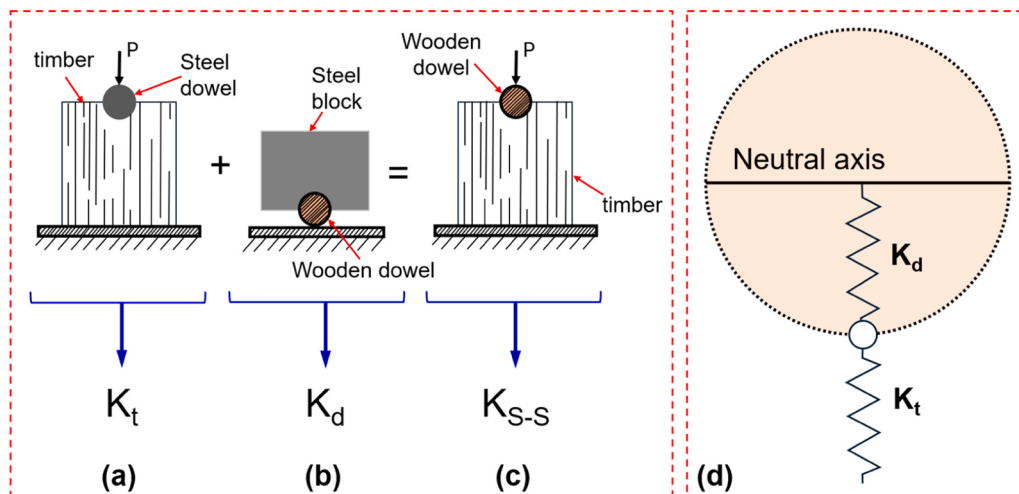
(a) Steel dowel embedment in timber (b) Wooden dowel embedment under action of steel block (c) Wooden dowel embedment in timber (d) S-S model.
